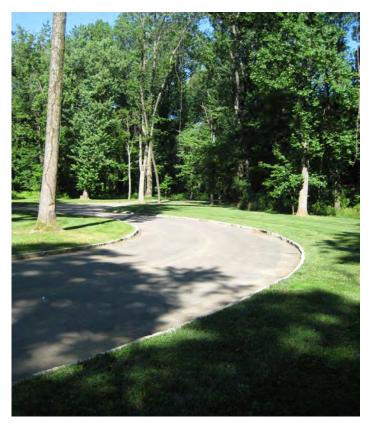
F. This residential street in a development using conservation and open space design uses narrower streets than traditional practices. (Photo Sabak, Wilson and Lingo Inc.)
